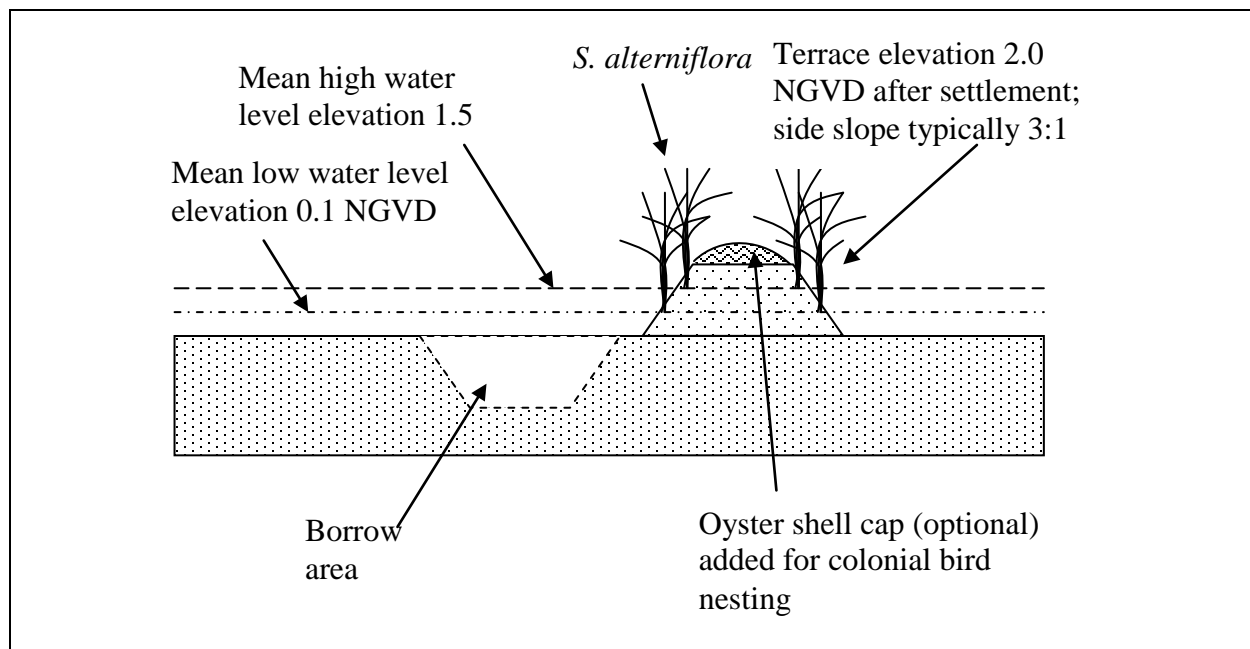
Cross sectional view of typical terraces constructed at Pierce Marsh. Water level elevations are determined from via bathymetric survey. Typical terrace elevations and water levels are given in National Geodetic Vertical Datum (NGVD). Terraces were constructed with a 3:1 side slope using material taken from the adjacent borrow area.
